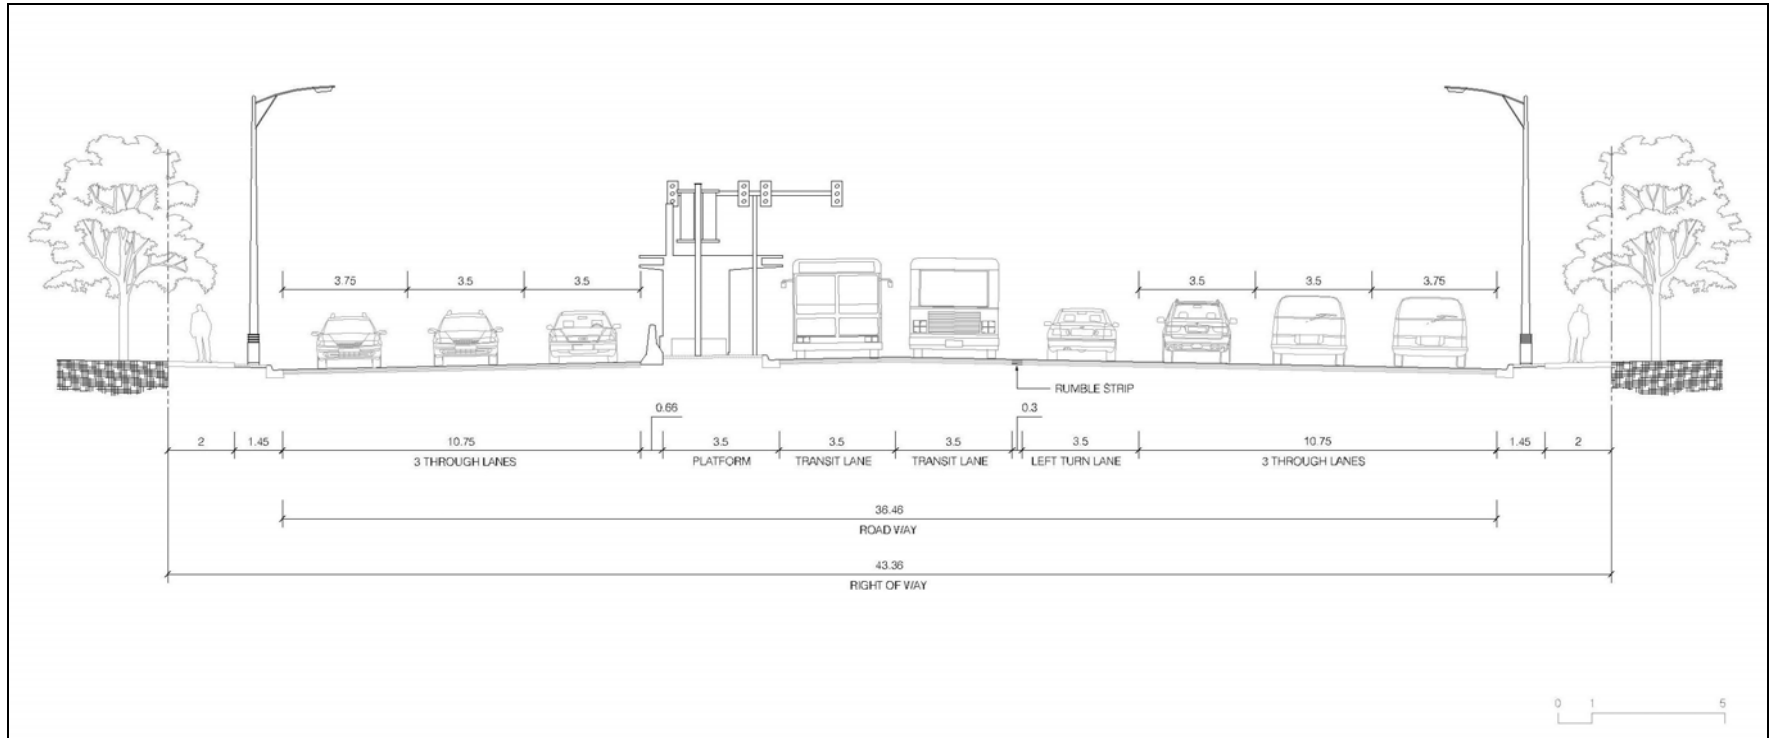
TYPICAL CROSS-SECTION OF BRT STATION
